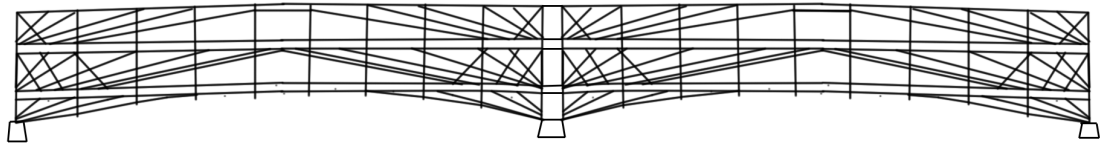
Truss/arch system of a Grubenmann Bridge
